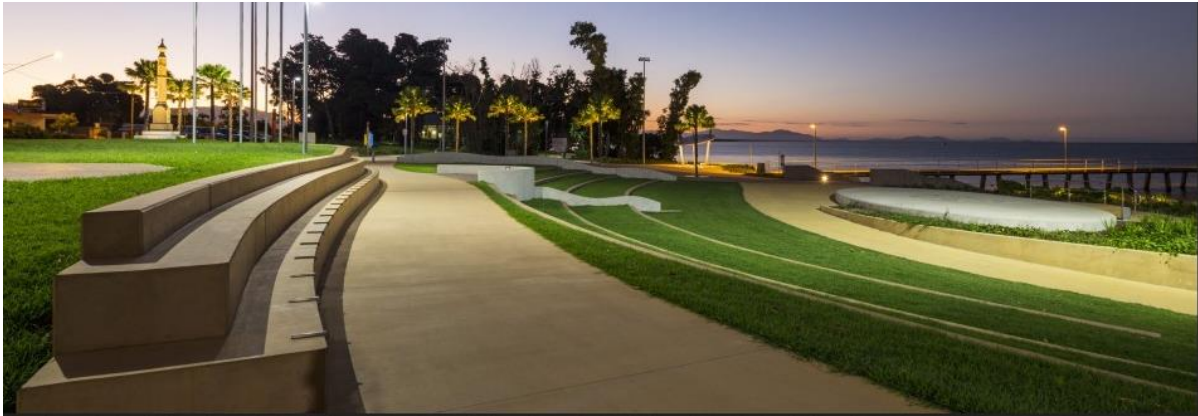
Raised concrete seating at the top of the amphitheatre structure acts as another wall to block wave run up if the ocean reaches this level (Watson 2014)
